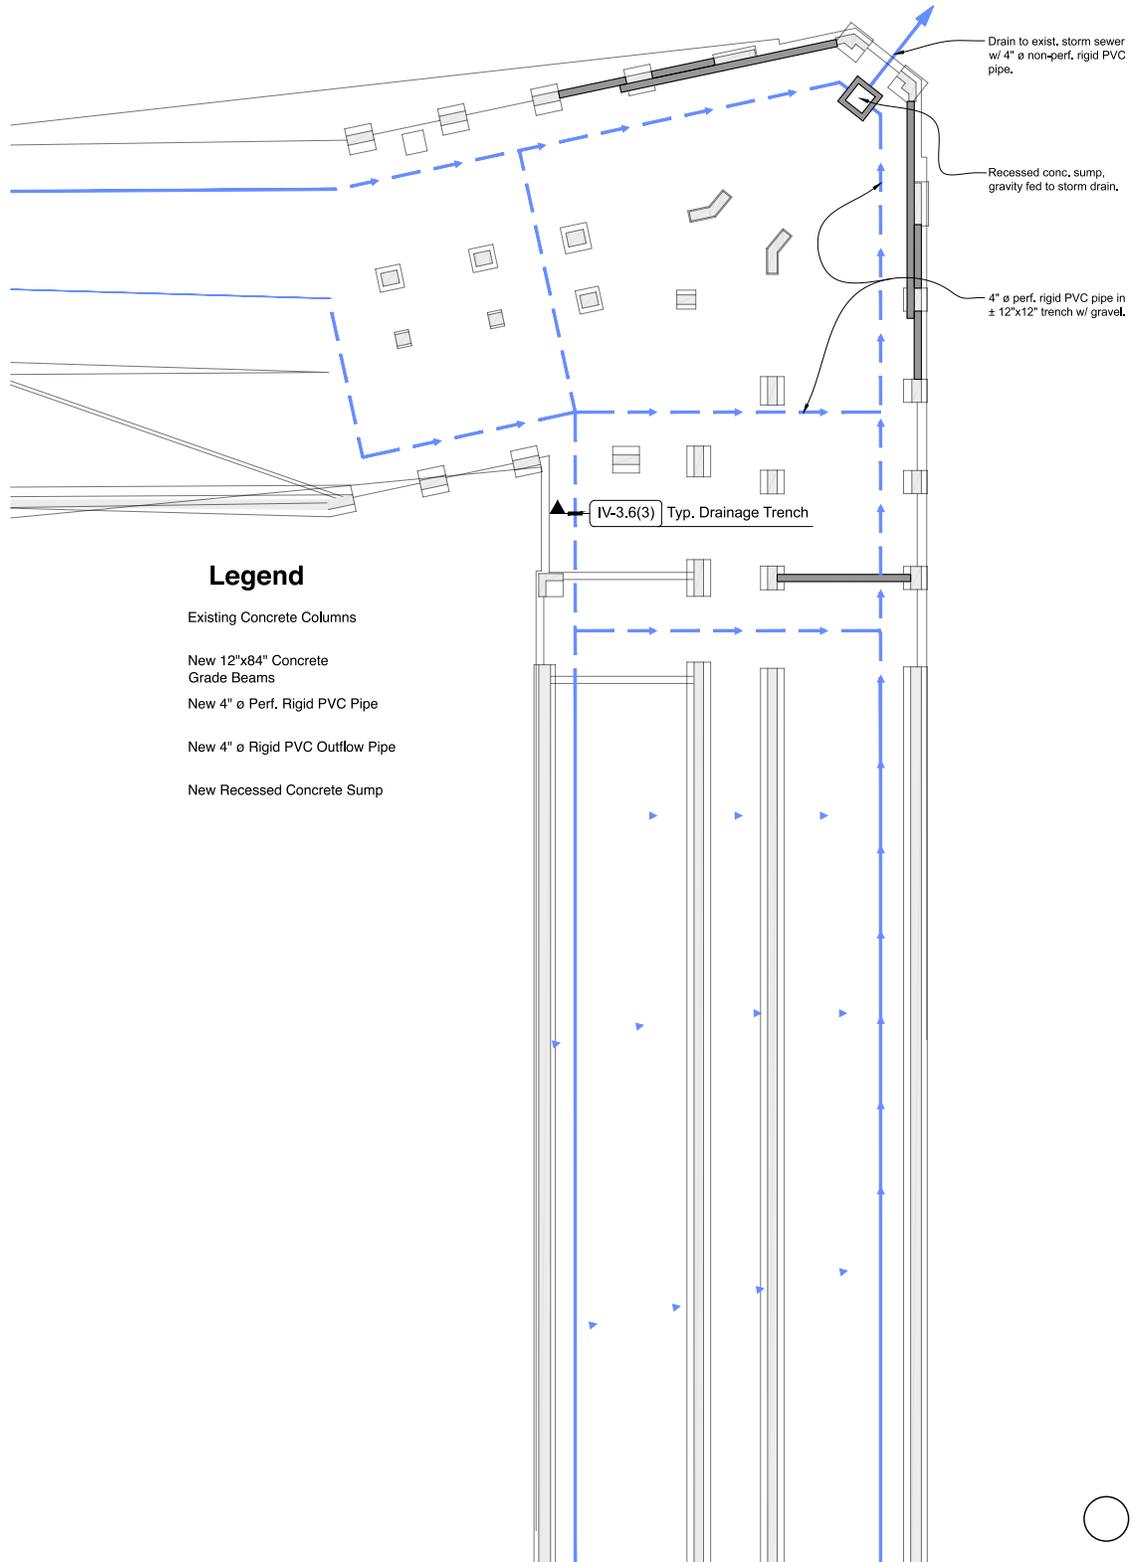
(1): General Configuration of Recommended Drainage System
